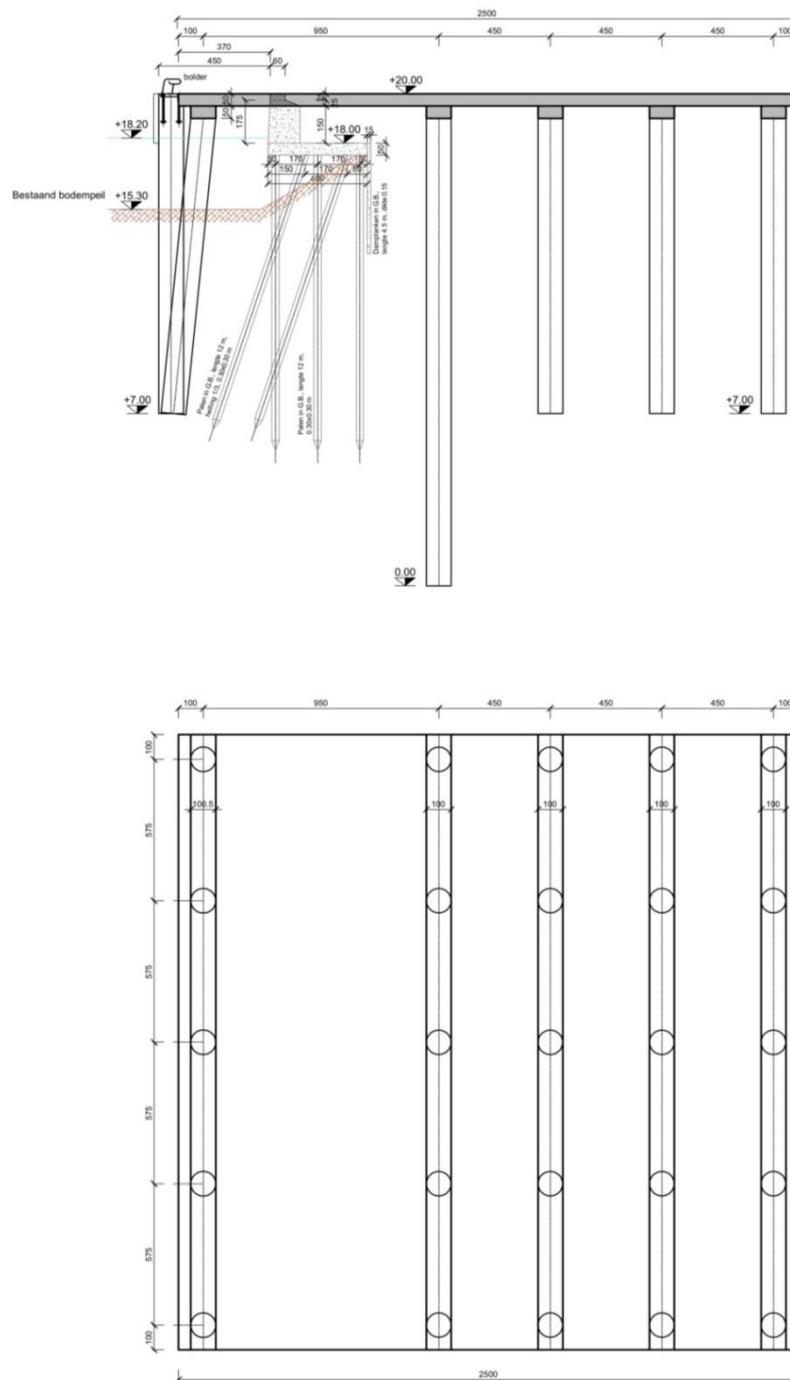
Biestebroek Dock – reinforced quay wall – loading/unloading area (source: Technum)
